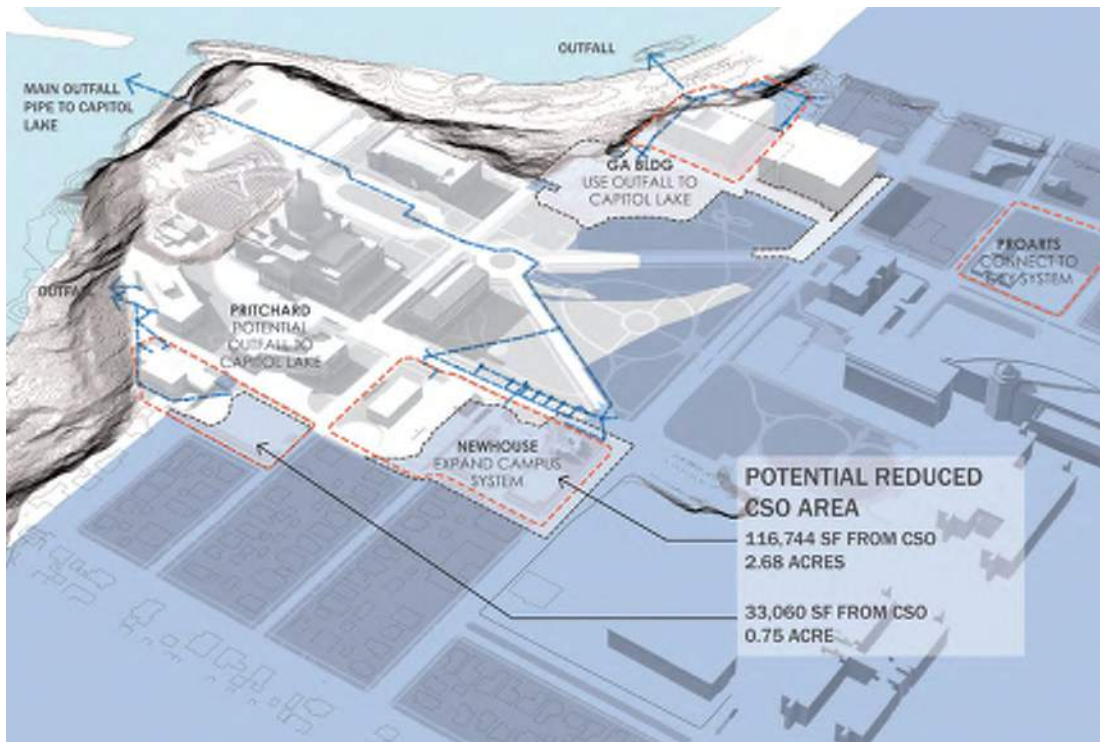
COMBINED SEWER OUTFALL PLAN
